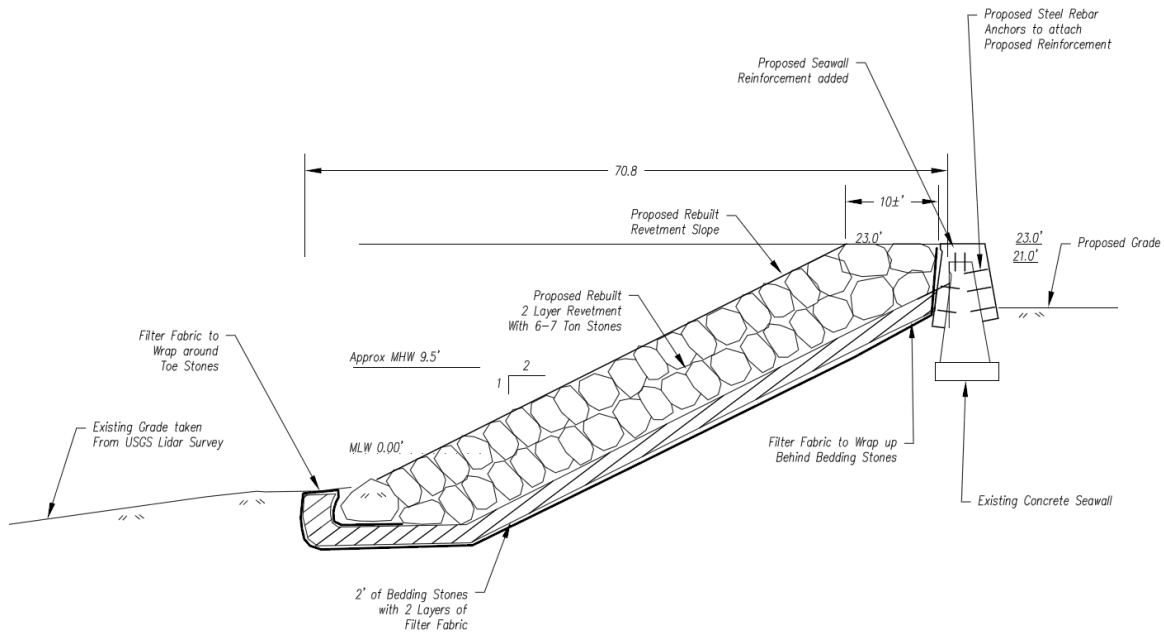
Typical seawall and revetment profile for station 0+50 to 10+00 with proposed 23 ft MLW seawall and revetment.
